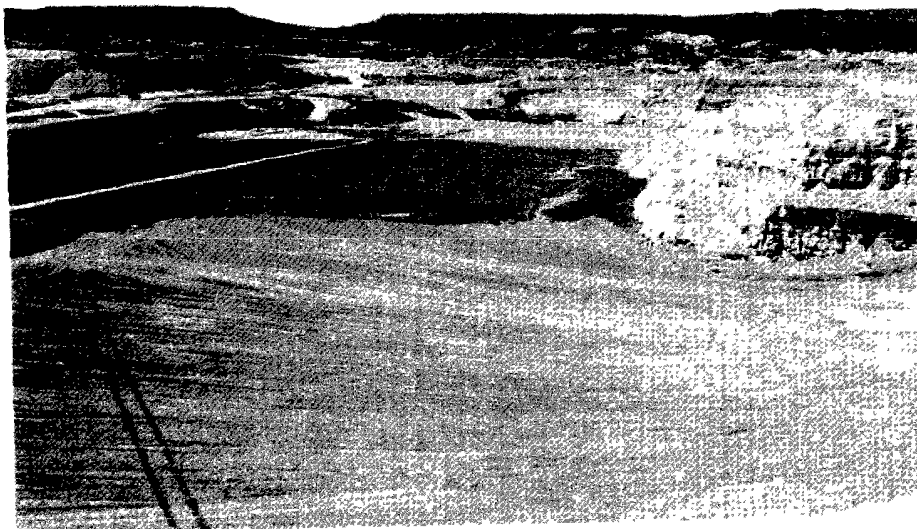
North Paguate Pit (looking west/southwest) showing shale and topsoil cover.
